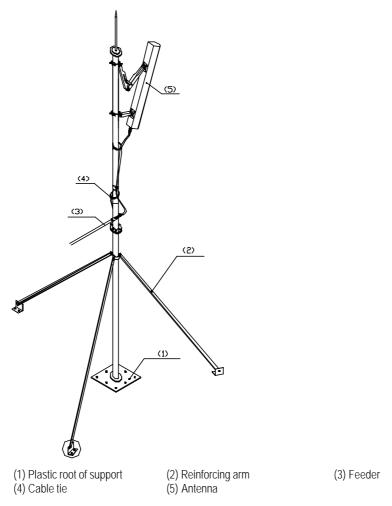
Installing the directional antenna on building-top (without parapet)
